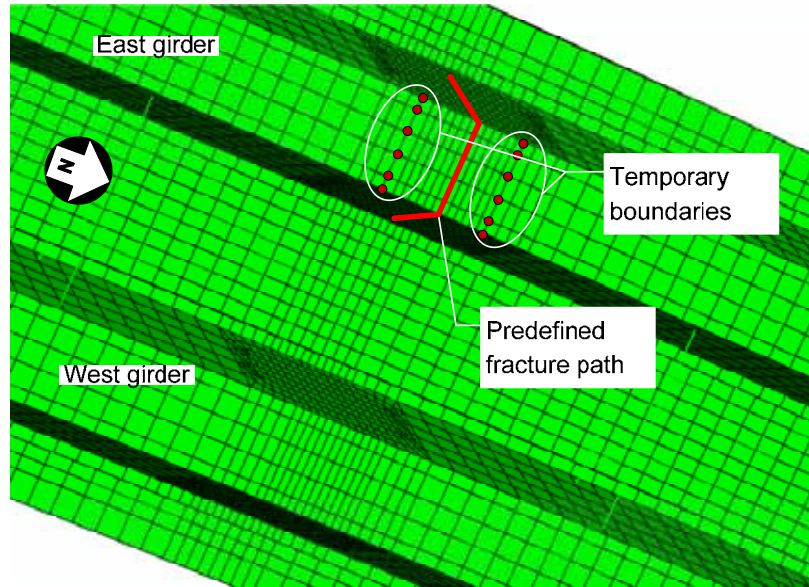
Predefined fracture path in east girder (looking upward from underneath bridge)
